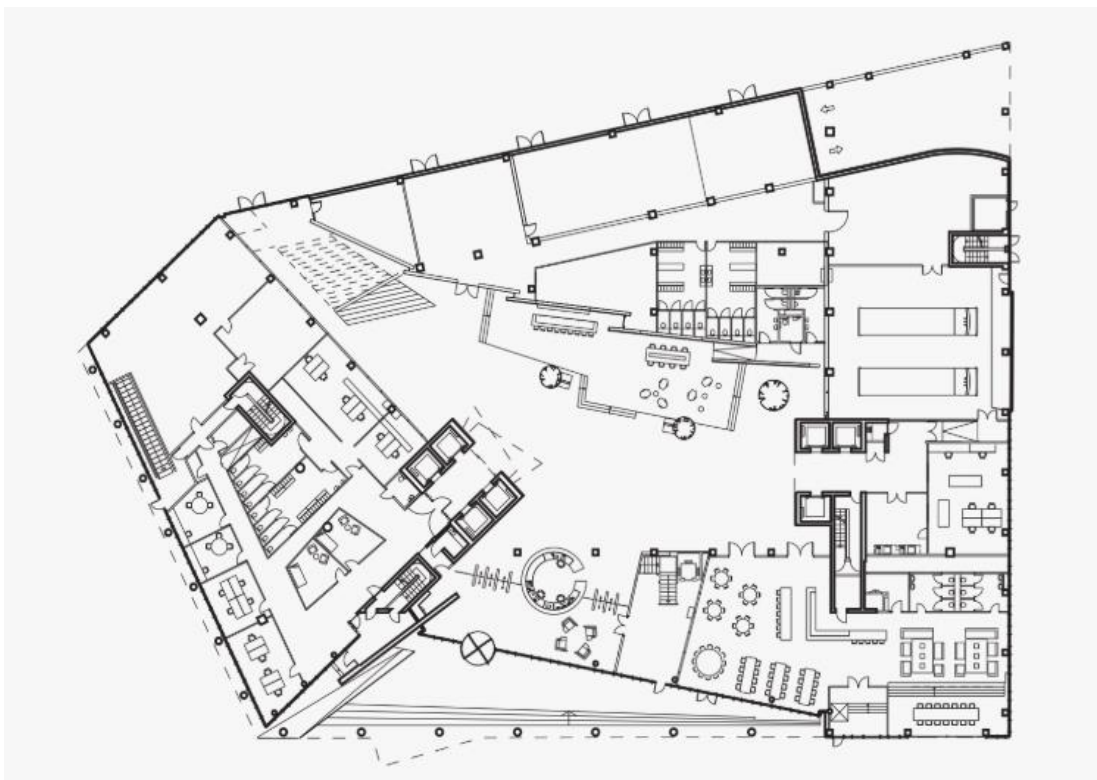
Ground Floor Plan (PLP Architecture, n.d.).
